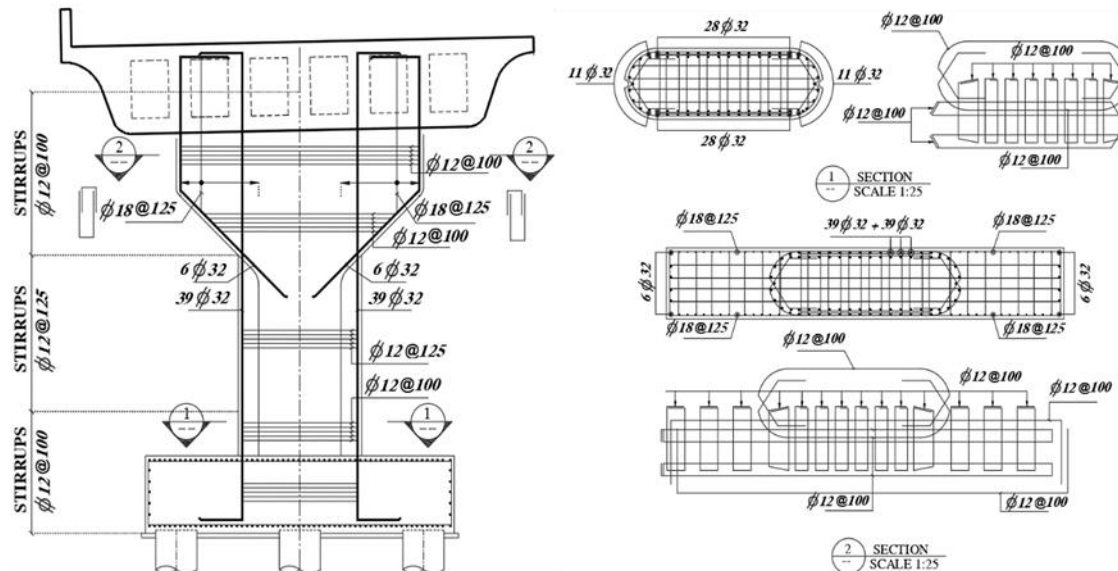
Reinforcement details of a supporting column in longitudinal and transverse directions.
